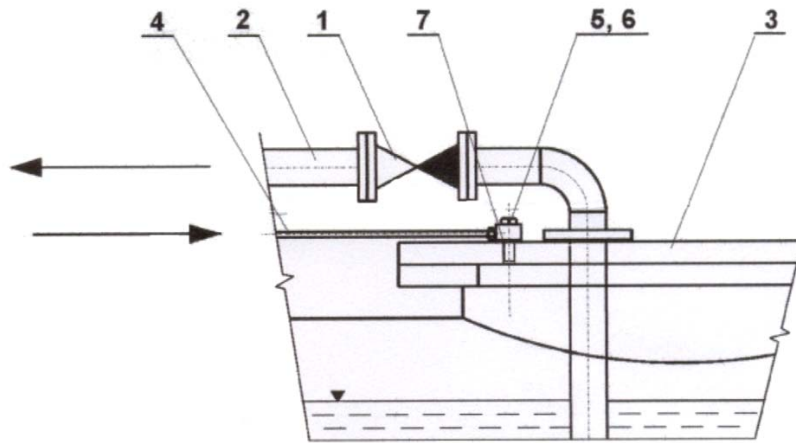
Example of suction piping connecting the dispenser to a surface tank
